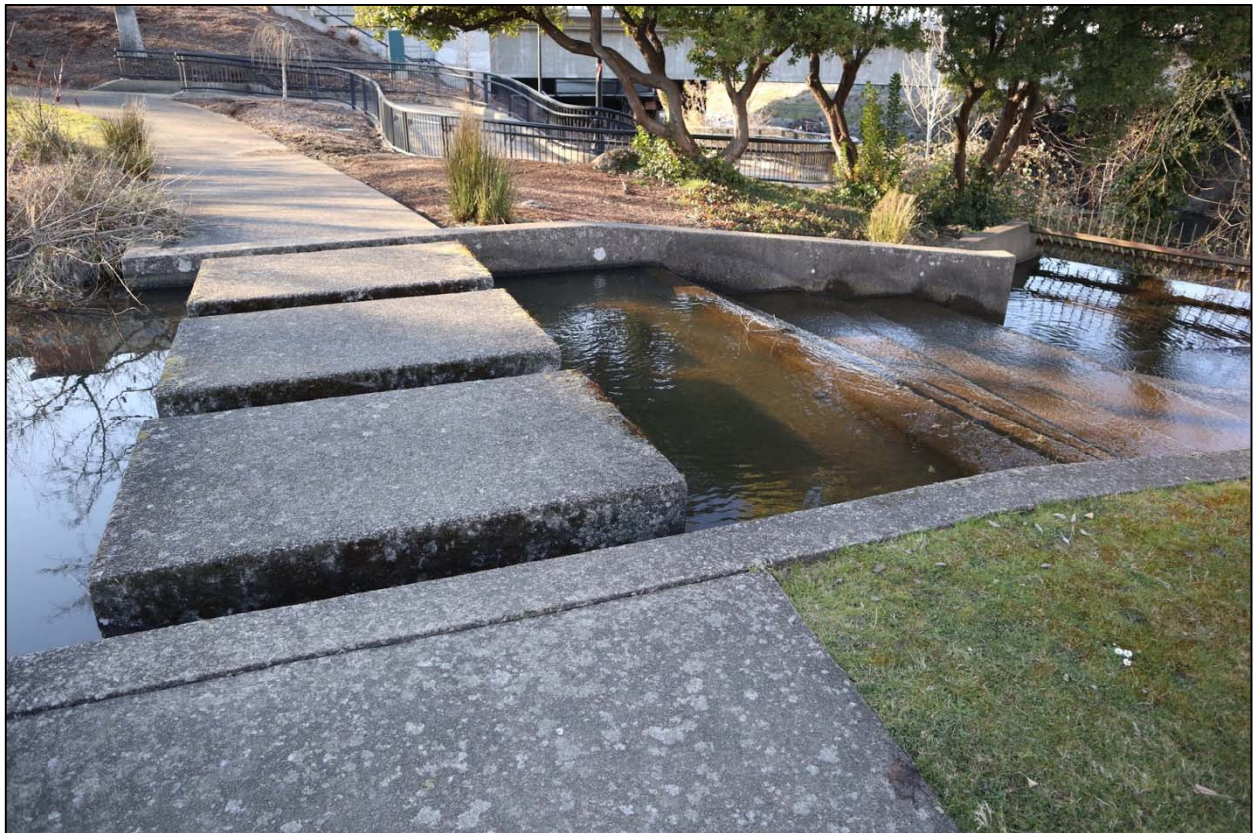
of 40. Mirror Pond and Pringle Creek, looking north.
